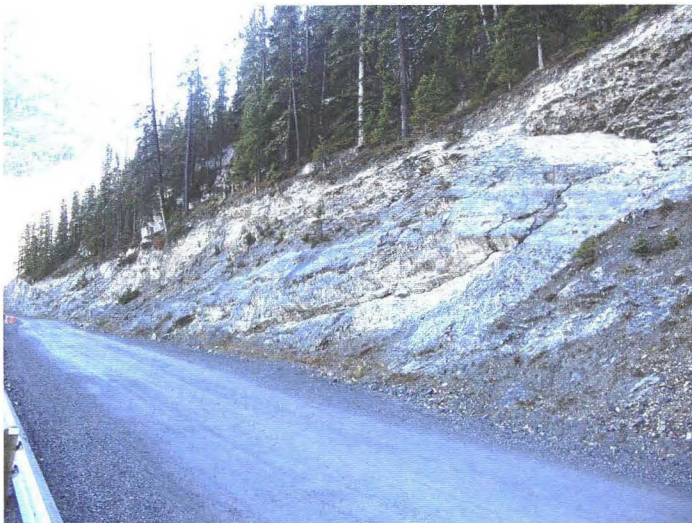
(bottom) – An area a short distance southbound from ~Km 5.6 where there appears to be a hazard of some large rocks breaking loose and sliding down the sheet joint plane and onto the road.
